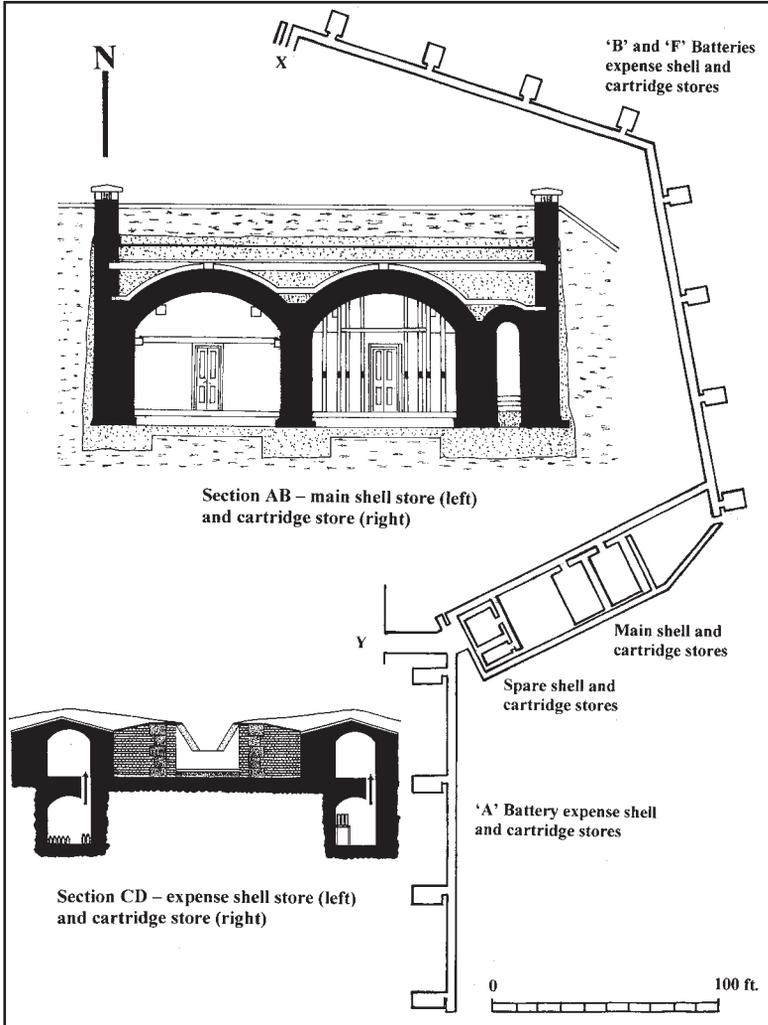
Plan of the magazines as built in 1868-72, with cross-sections.
